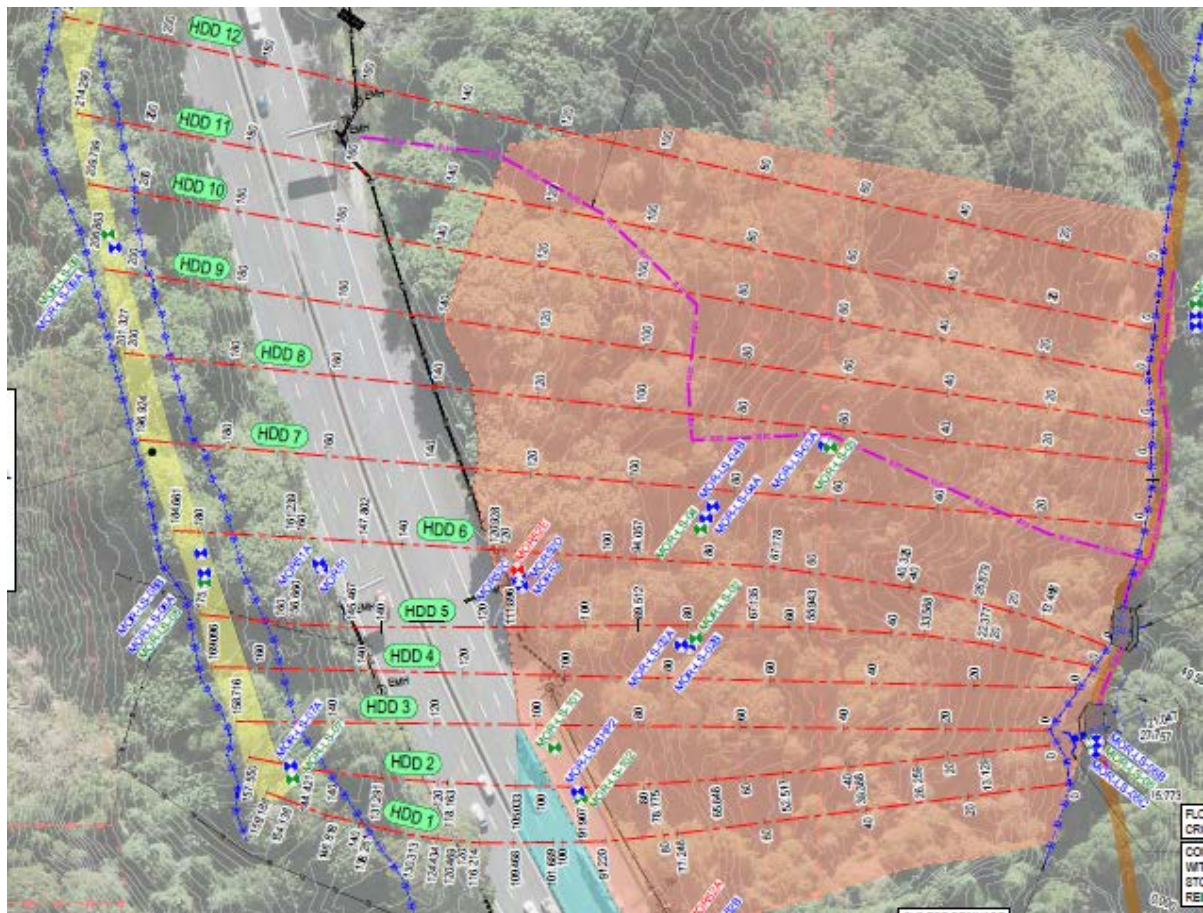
Detailed design showing 12 horizontal drains installed under Mount Ousley Road.
